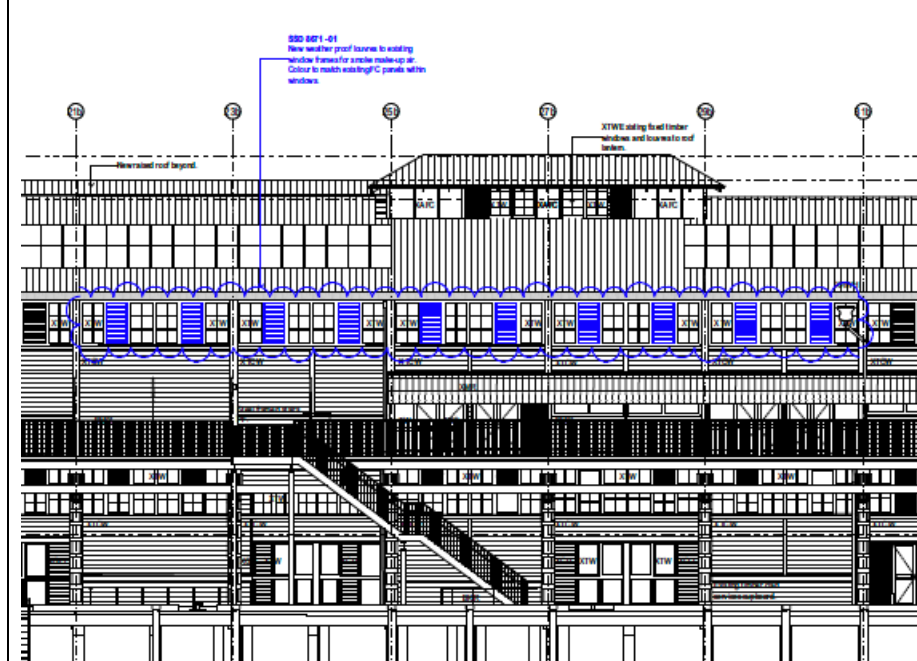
proposed eastern façade (Plan A-222, 24/01/22)
